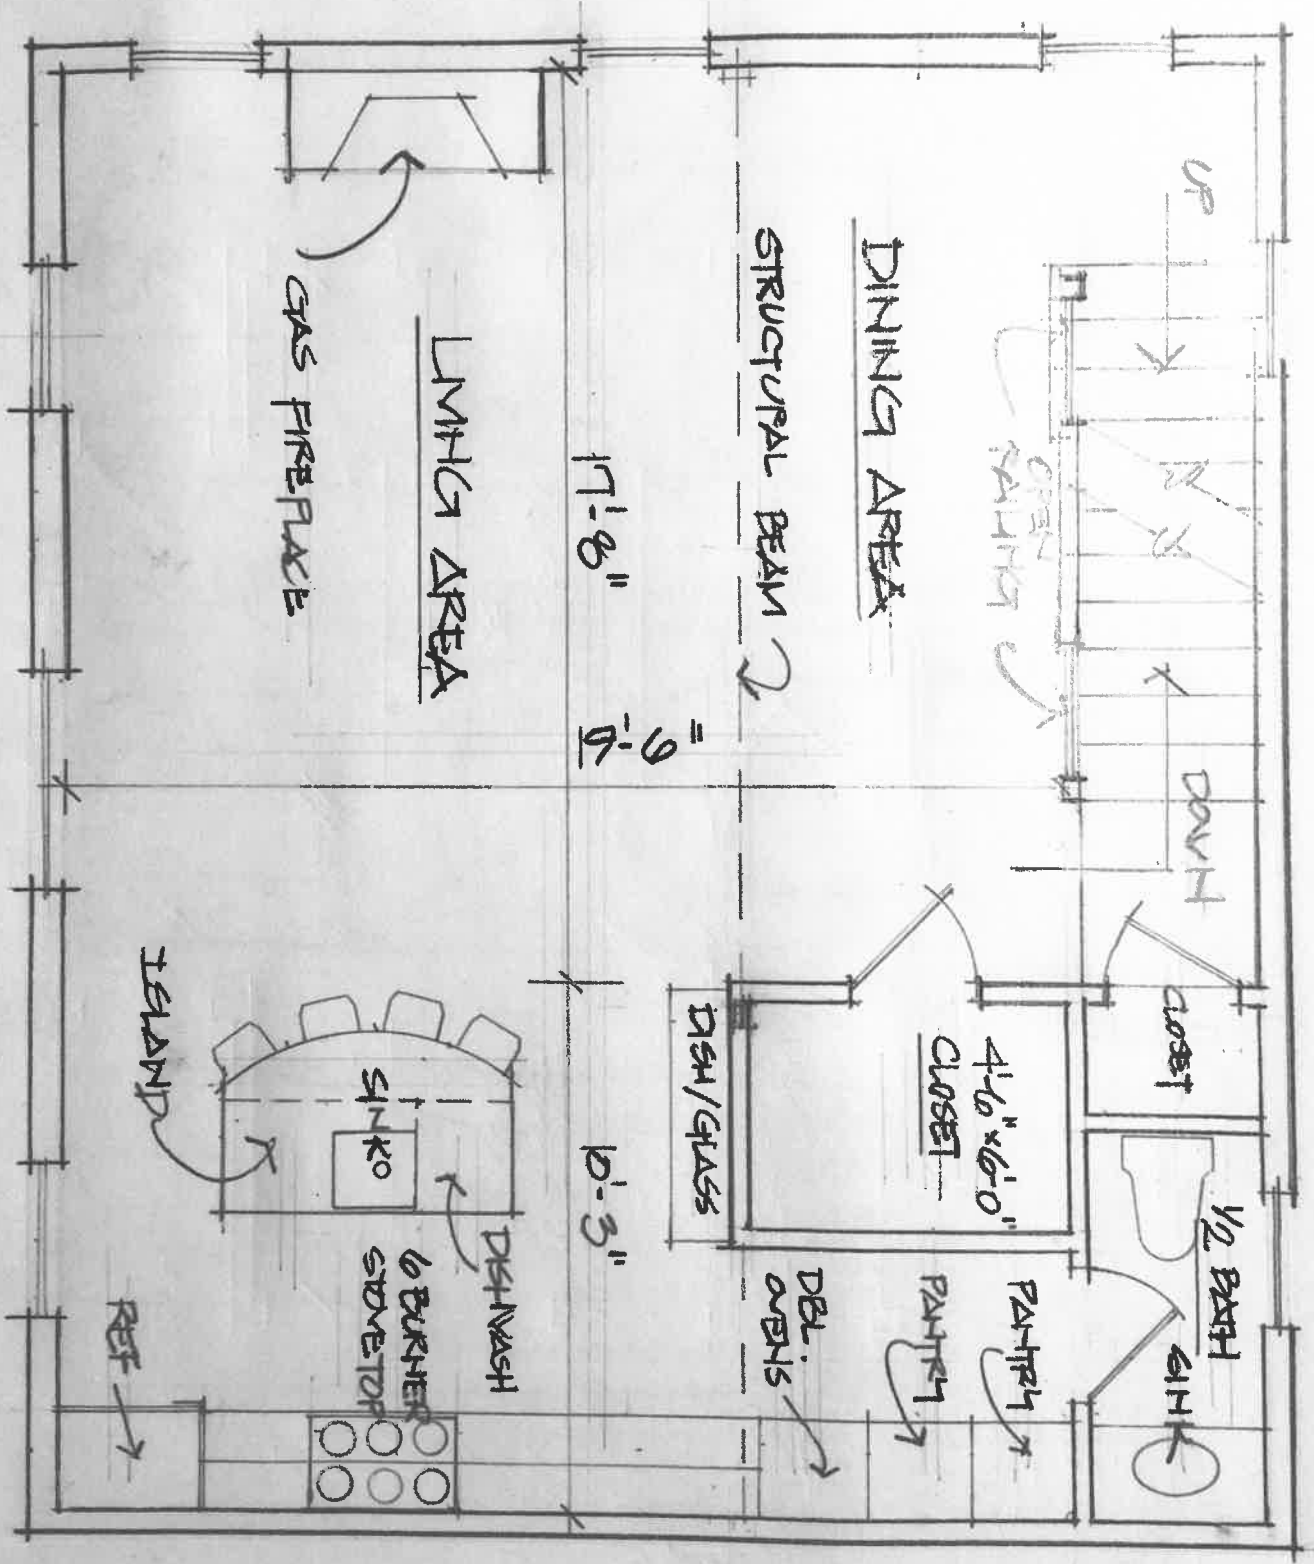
PROPOSED FLOOR PLANS
